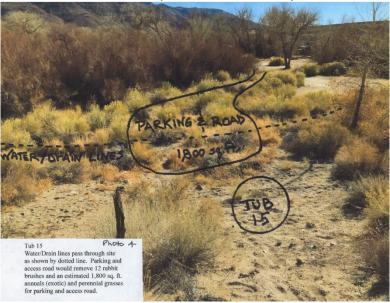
PROPOSED TUB SITE 15 (NOVEMBER 2020)
